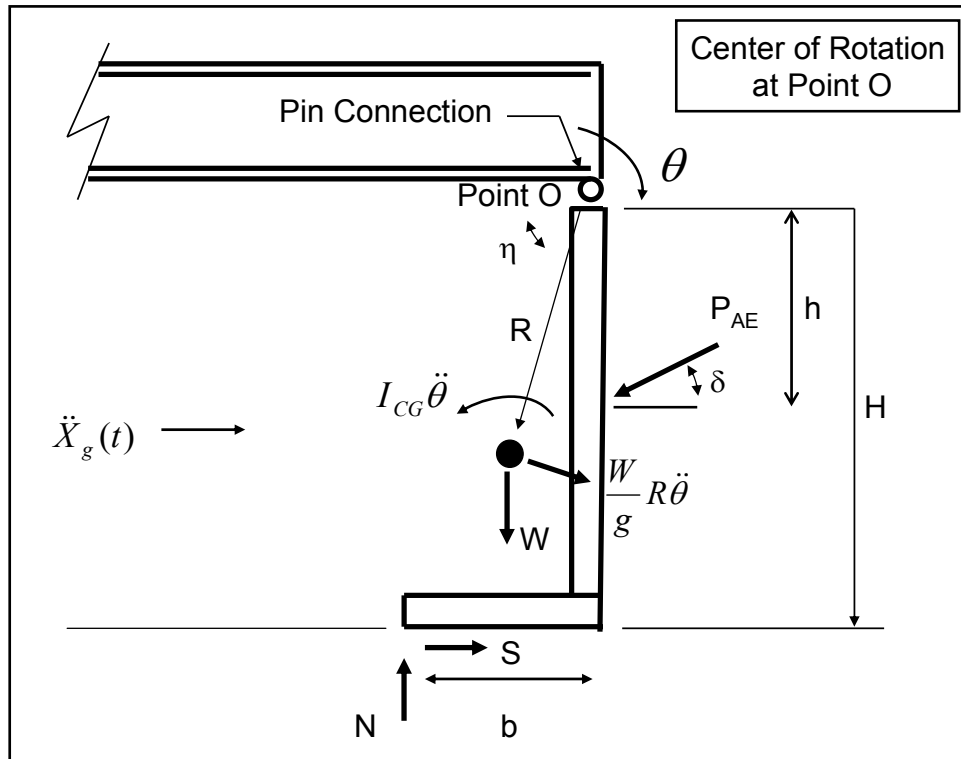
Free-body diagram of bridge abutment with fixed connection to bridge deck (after Fishman and Richards (1997)).
